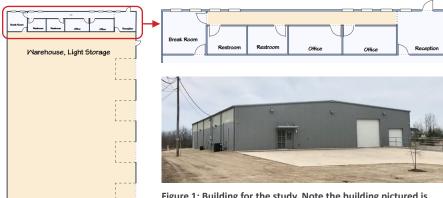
Building for the study. Note the building pictured is similar in size but has a different floor plan.
